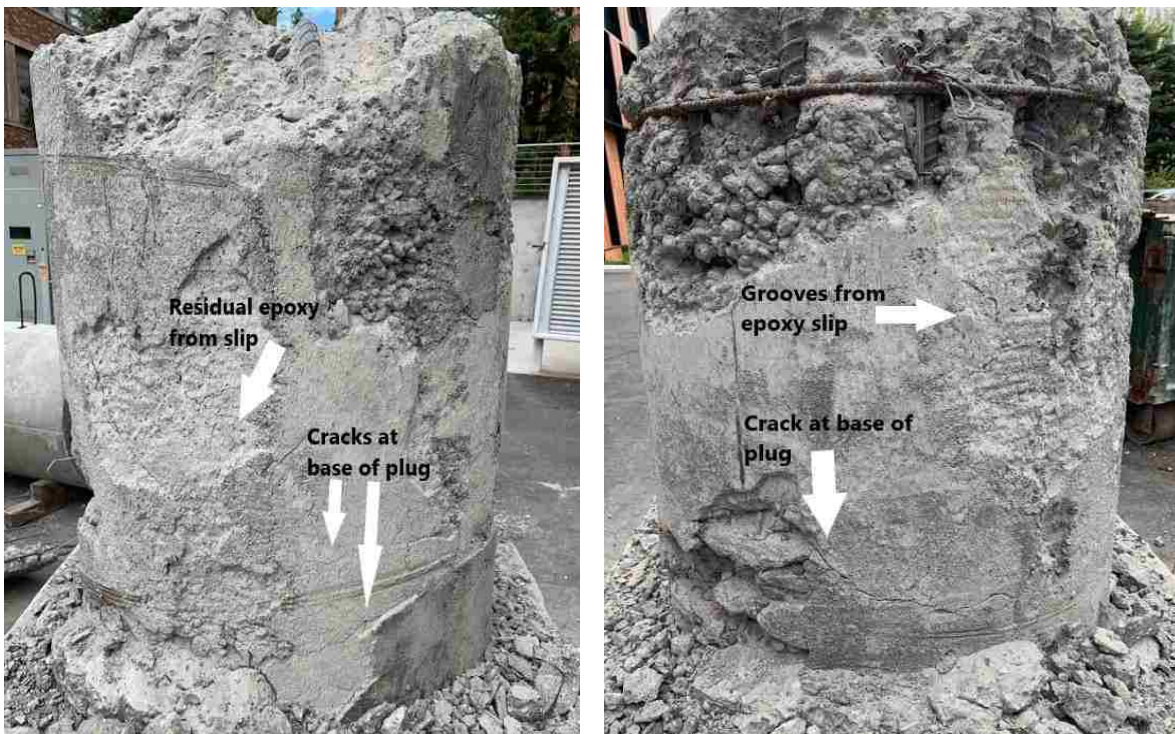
North (left) face and south (right) face of plug after pile-column wall detachment
